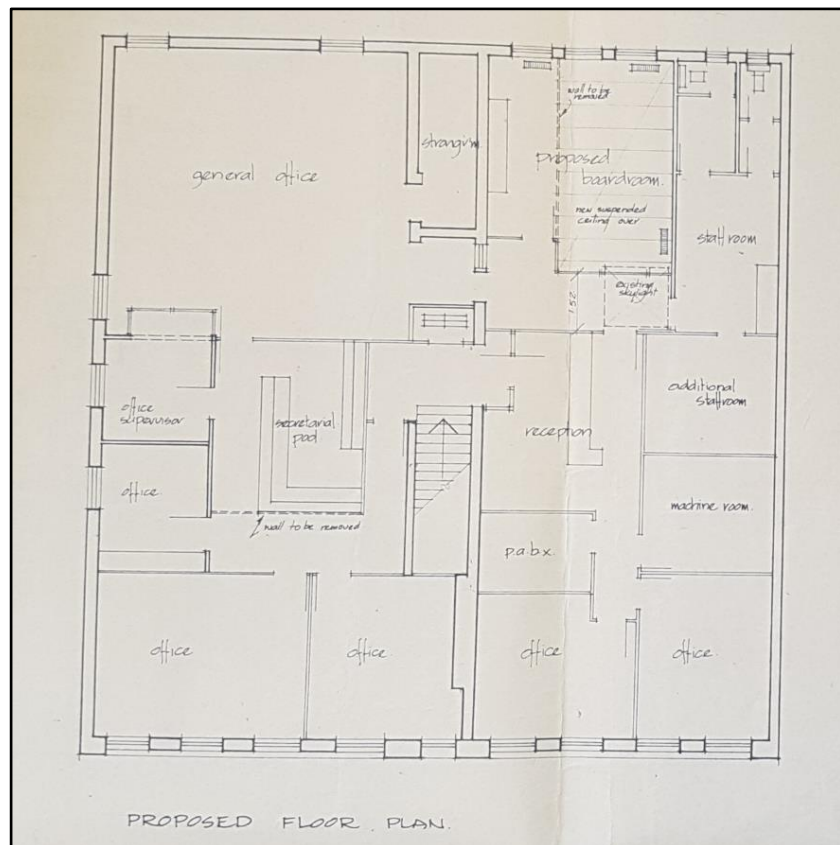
Details from 1980 plan of the Temple Chambers at 45-49 Esk Street, showing alterations to first floor plan (Gray Hesselin & Baxter, 1980).
